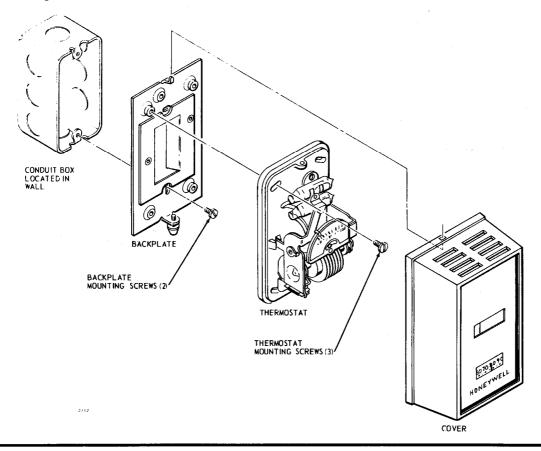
Mounting the T42 on vertical outlet box. Follow instruction sheet packed with bag assembly when mounting the T42 on a horizontal outlet box.
